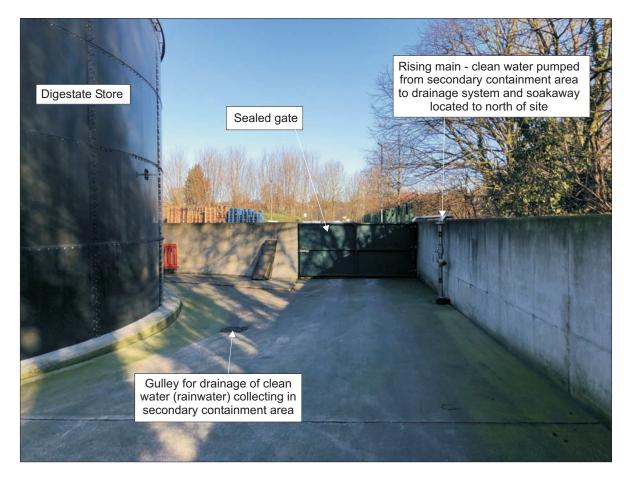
Retaining bund (walls) and sealed gate at north-eastern corner of site
